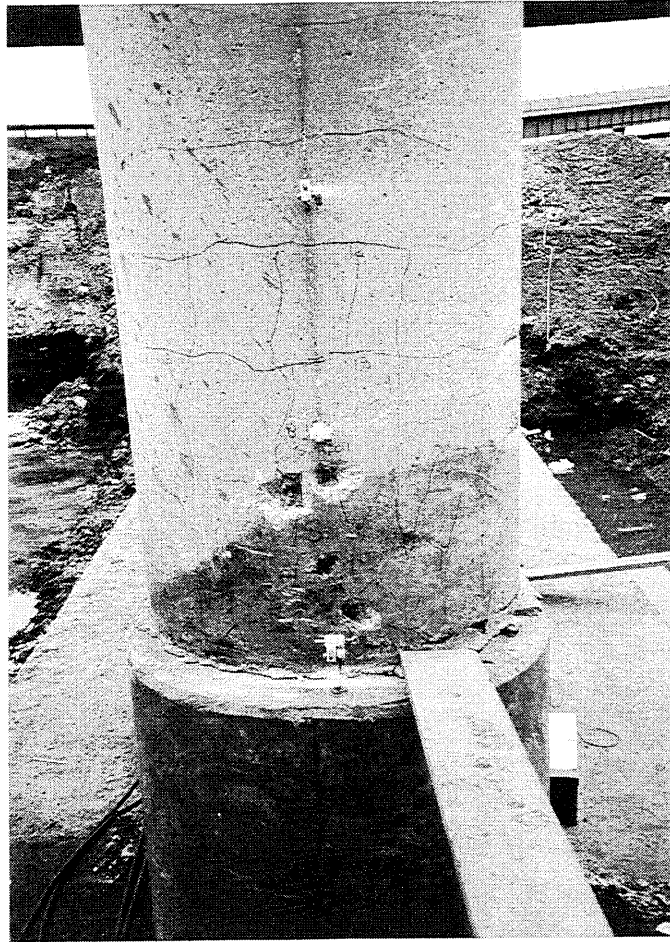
Vertical and Horizontal Cracks on the Column Bottom Part
